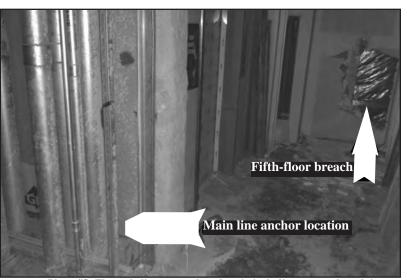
The main line was anchored to six-inch-diameter steel conduit on the fifth floor. This was eight feet back from the breached wall. This breach is where FF Baron entered the shaft. The main line and safety line were operated on this floor.
